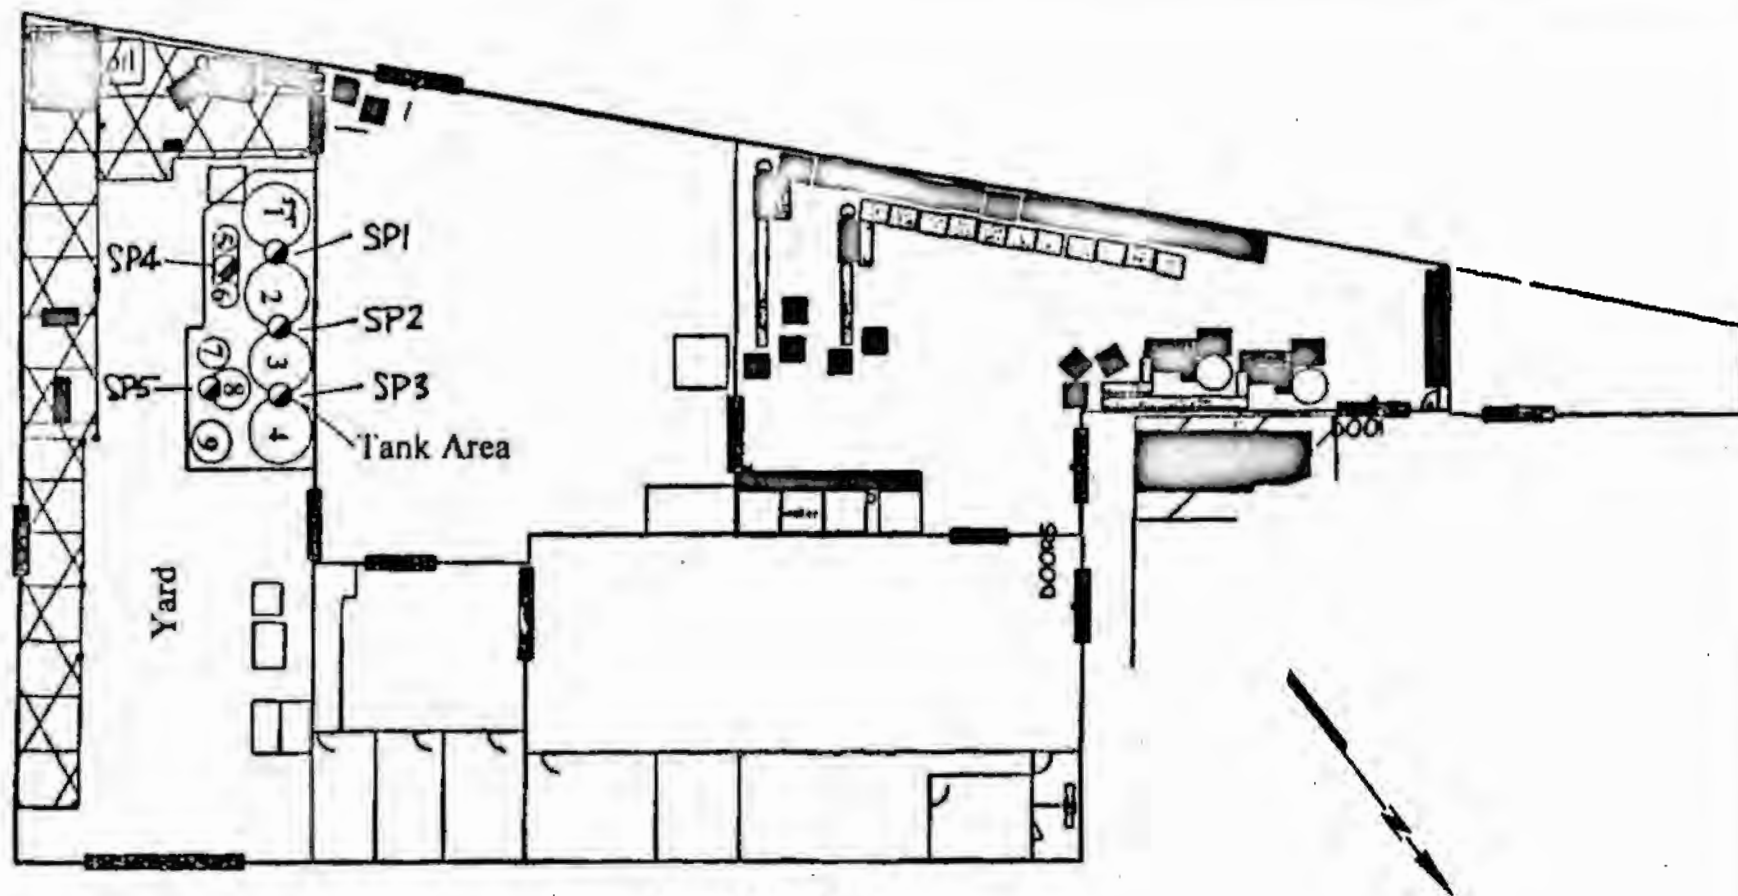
SITE PLAN SHOWING SAMPLING LOCATIONS
